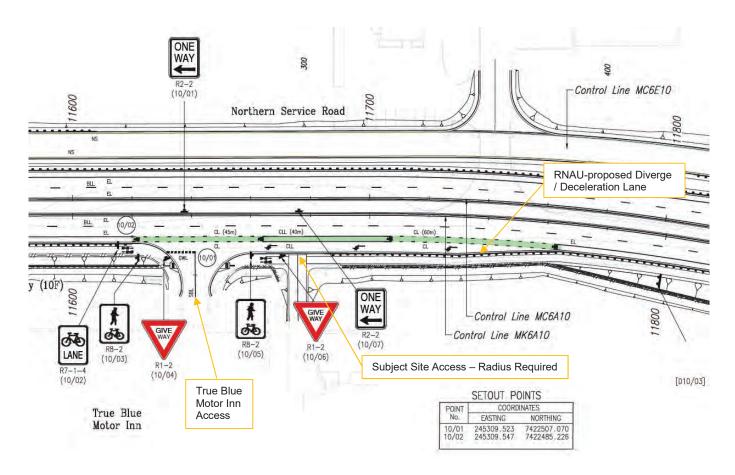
Access Arrangement Proposed in RNAU Documentation (from August 2018)
